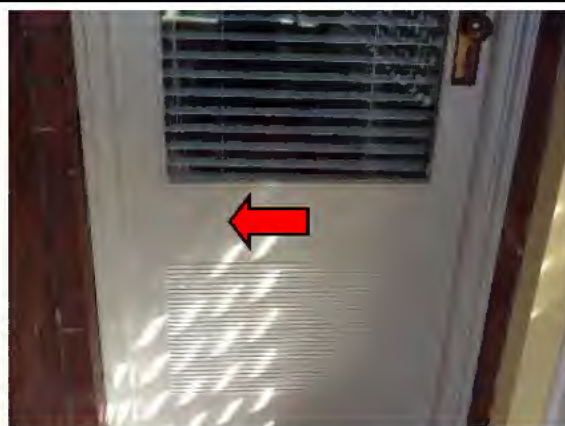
Level 1 & 2, Exterior, Door & frames – Lead-containing cream upper & white lower coloured paint systems
